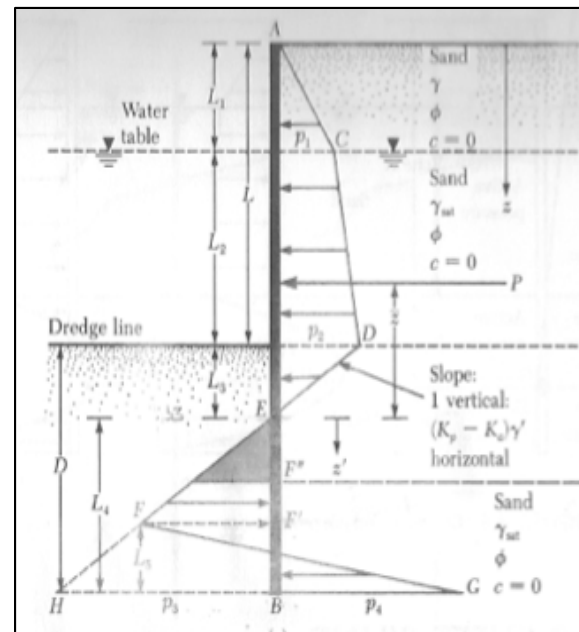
Cantilever sheet piling penetrating sandy soils [2]
